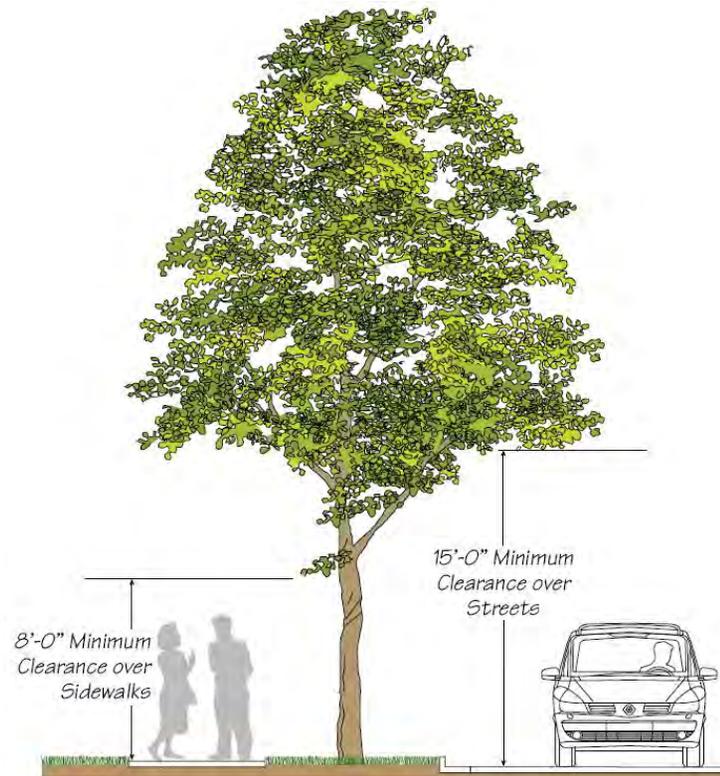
Trees shall be pruned to provide clearance over sidewalks and streets.
